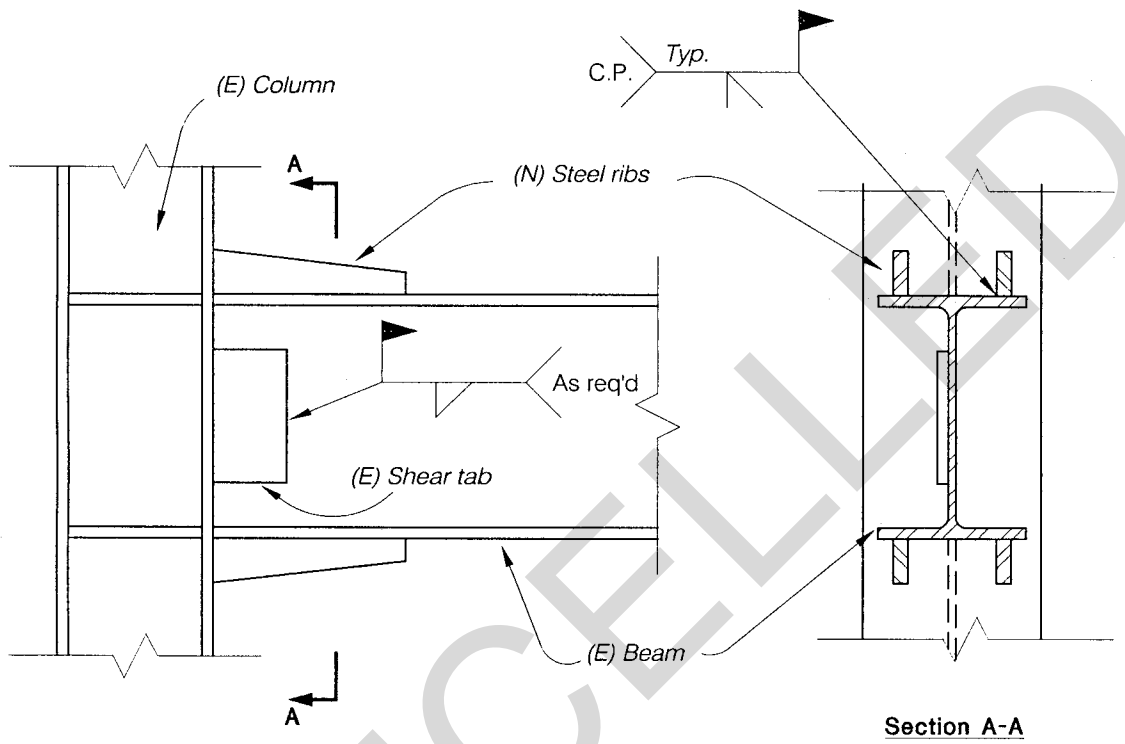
Strengthening a Pre-Northridge Moment Connection
